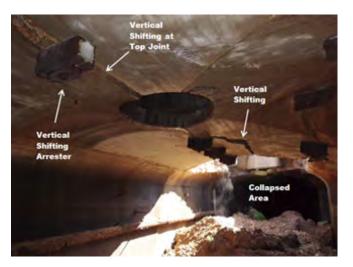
CEILING VAULT DAMAGE NEAR COLLAPSED BAY
